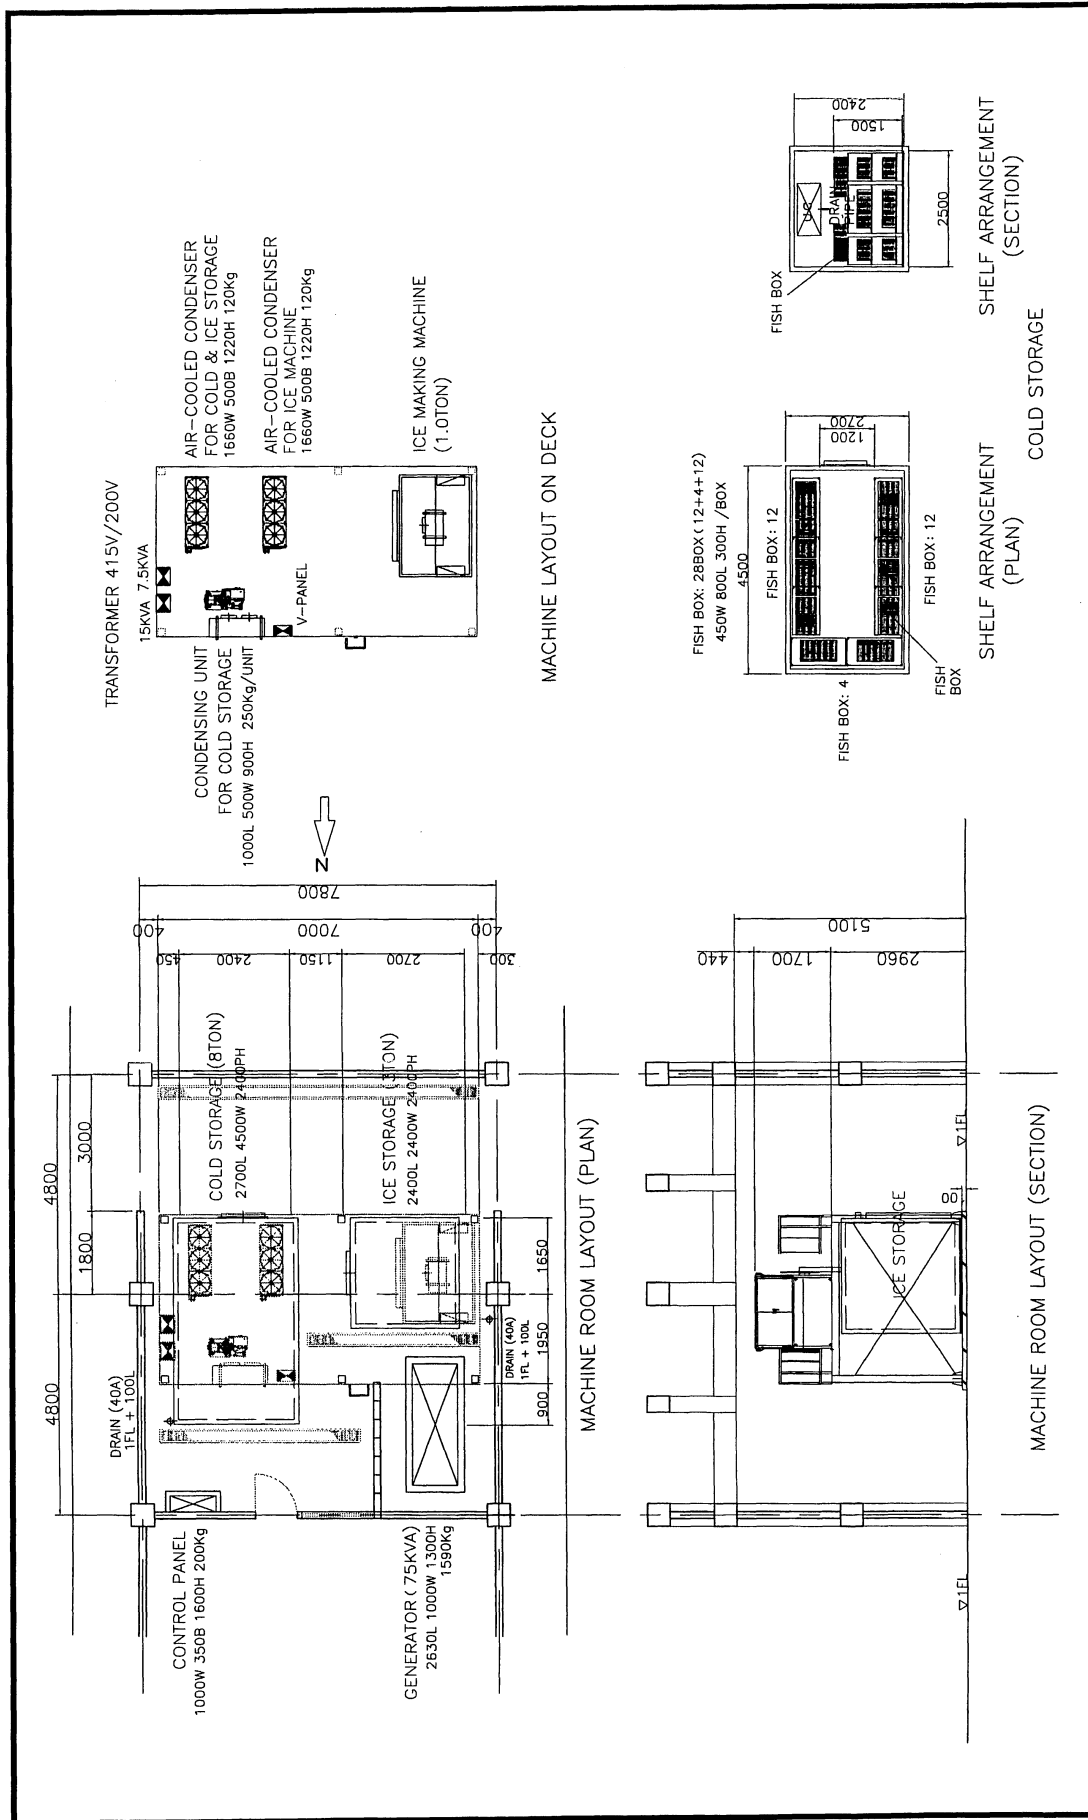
Facility Plan of Ice-making / Cold Storage
